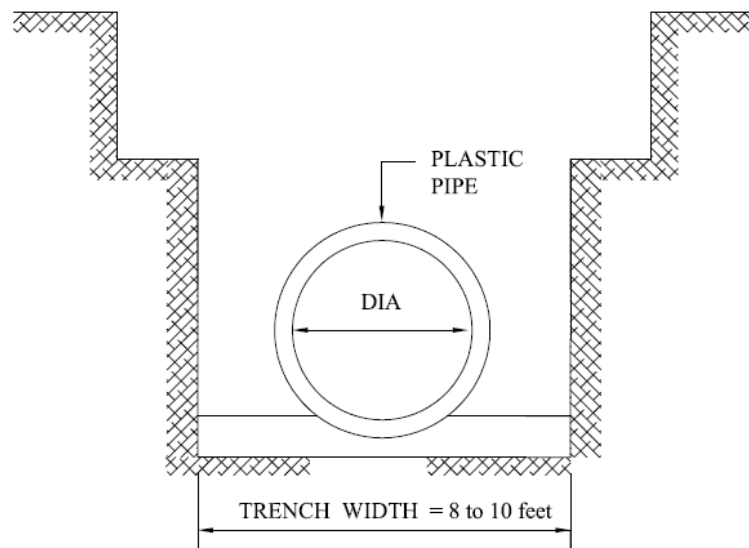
Stepped Trench Used for 54-inch Diameter Pipe
